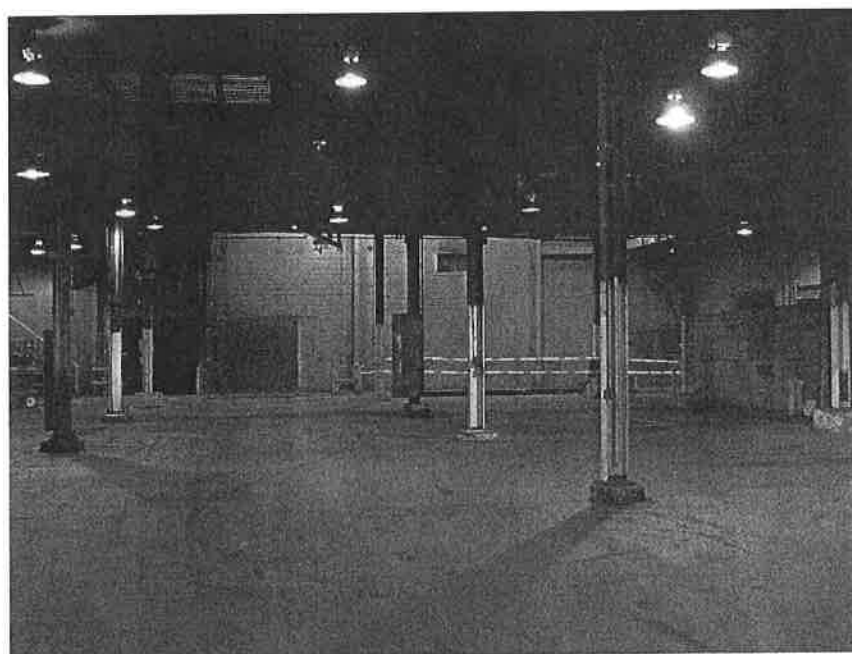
Typical building floor slab. View to north; photograph taken on March 5, 2015.
